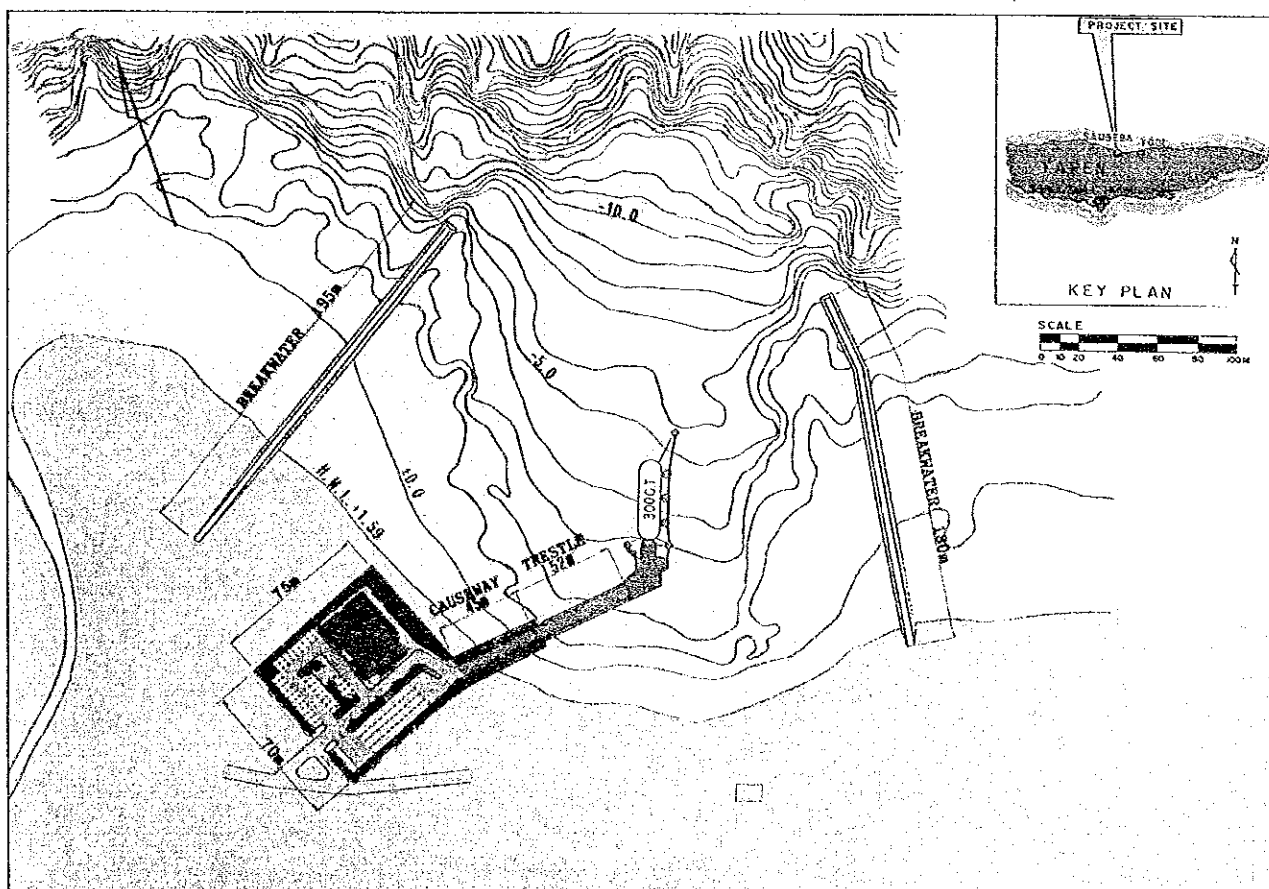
Layout of Saubeba Ferry Terminal
